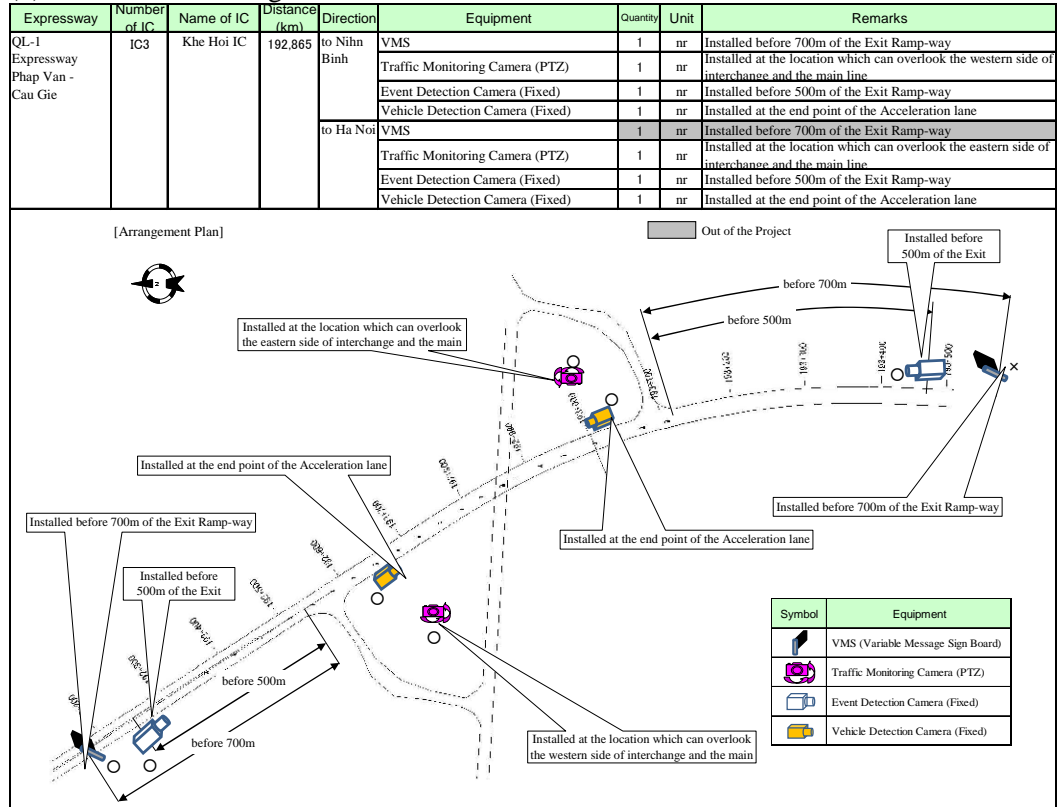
Equipment Layout Plan at Khe Hoi Interchange
